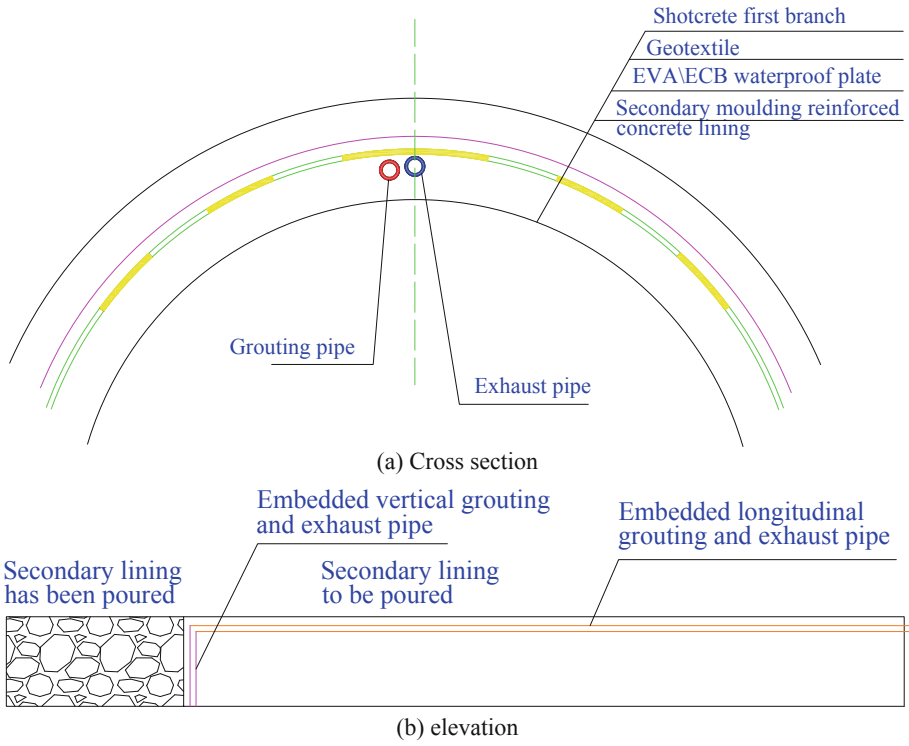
Schematic diagram of grouting pipe and exhaust pipe buried.
